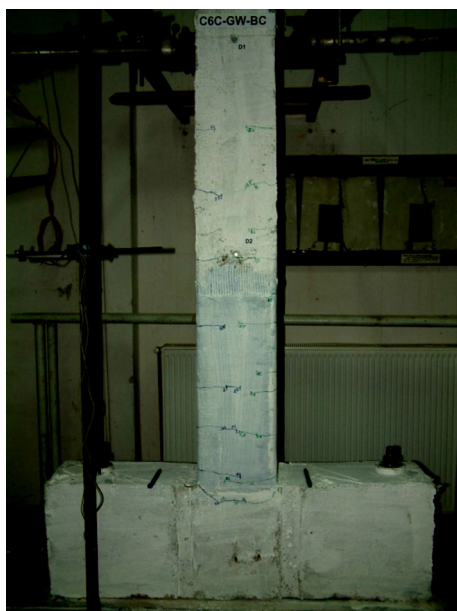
General view of experimental stand element C6C1–GW–BC after retrofit with crack pattern [16]
